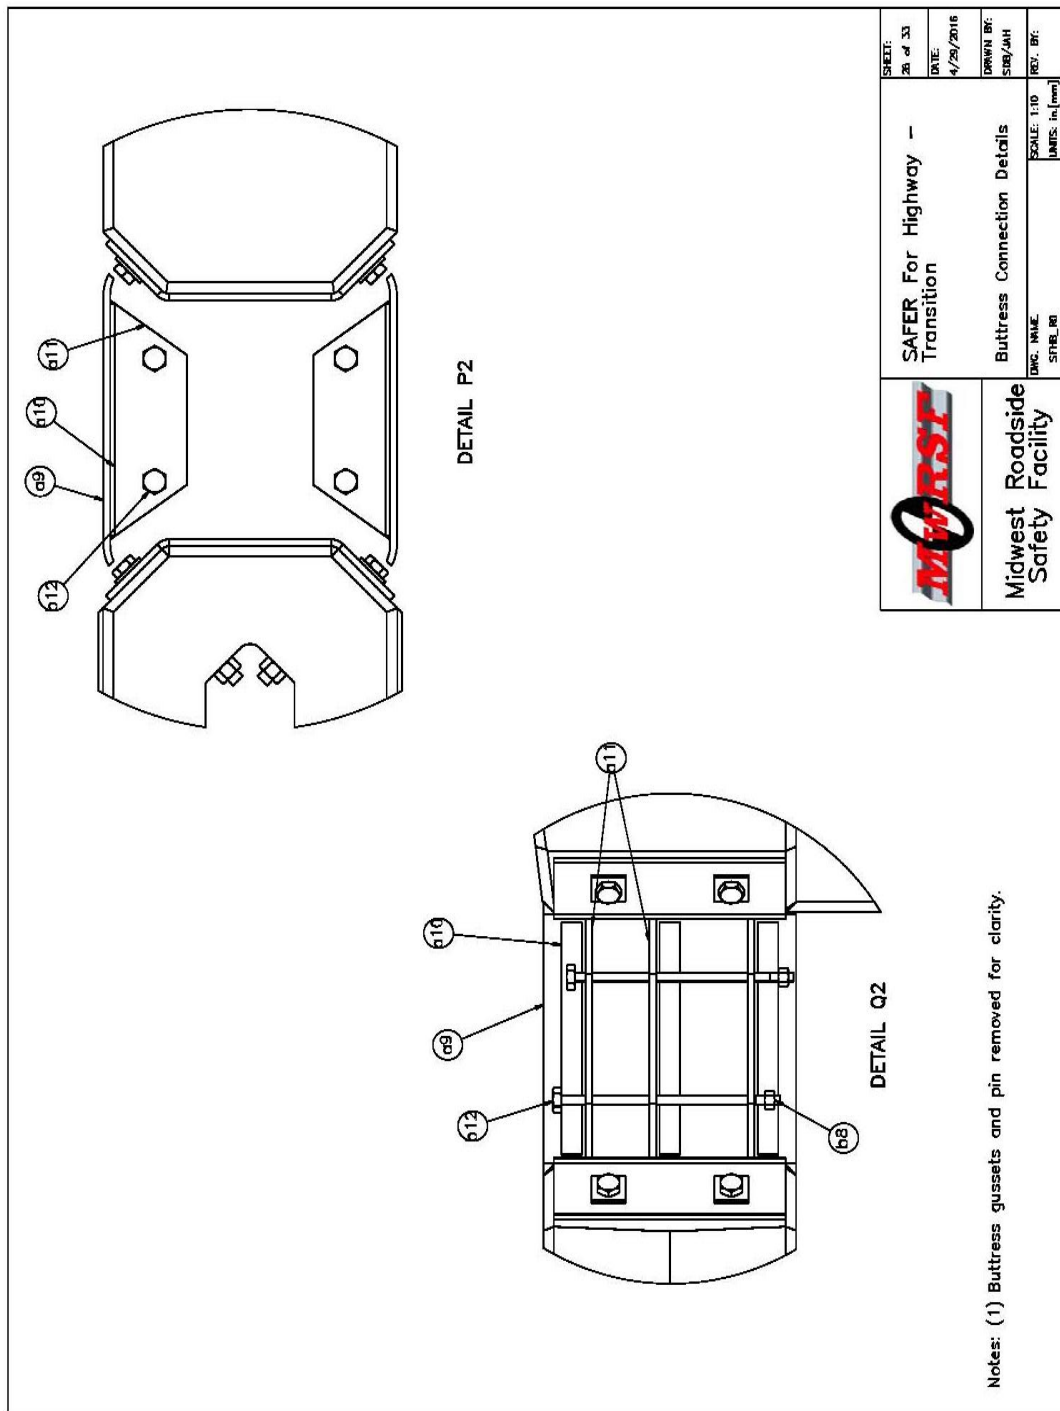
Buttress Connection Details, RESTORE Barrier Transition
